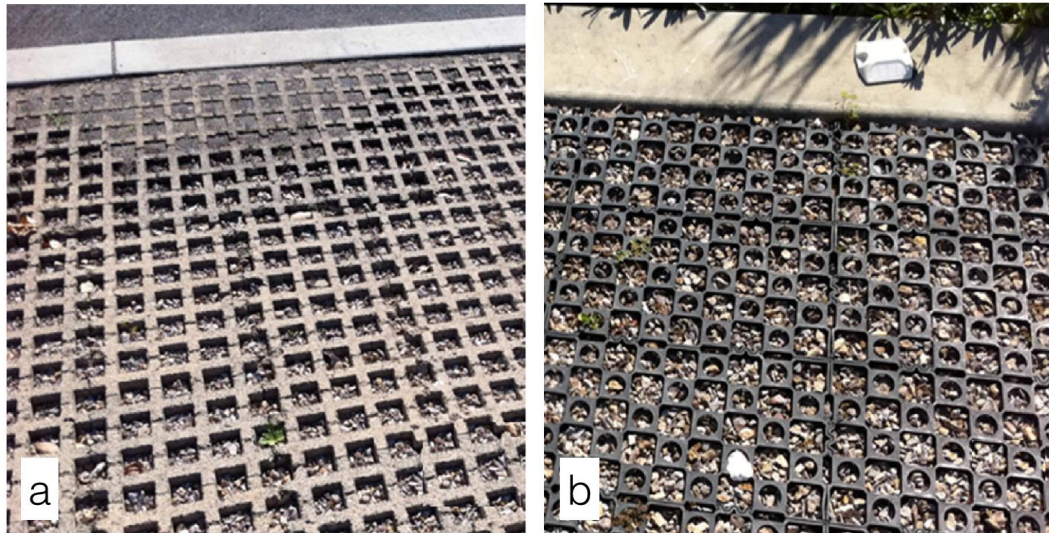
Showing, (a) Concrete Grid Pavers (CGP), (b) plastic reinforcement grid pavers (PGP) (Mullaney and Luke , 2014).
